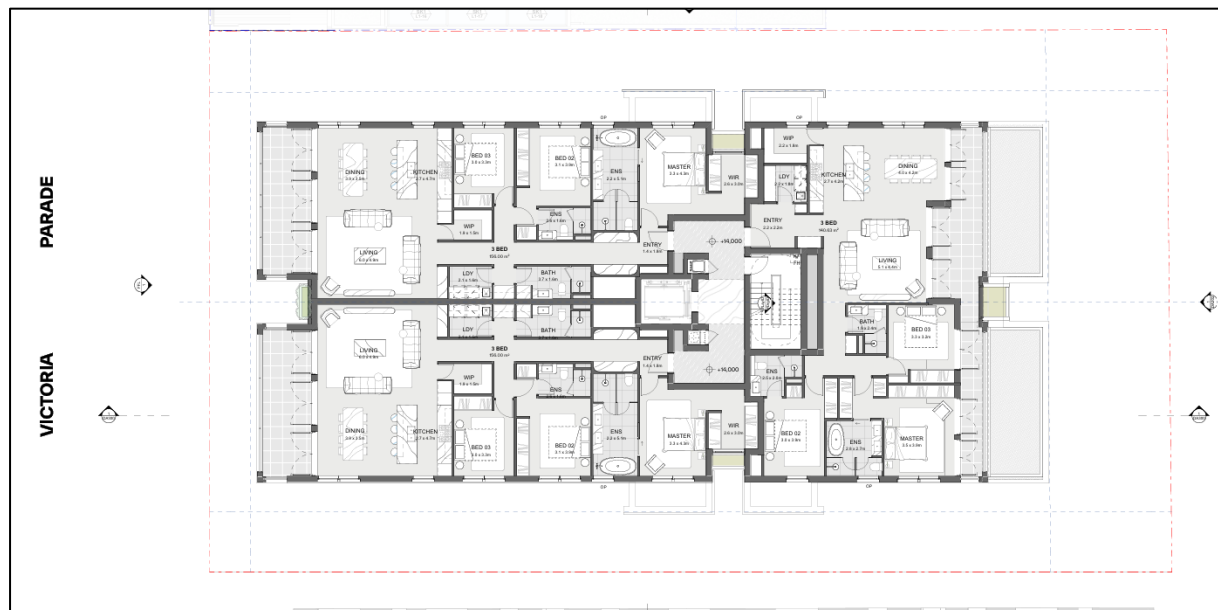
Floor Plan for Level 3 (Source: PBD Architects, 2026)
